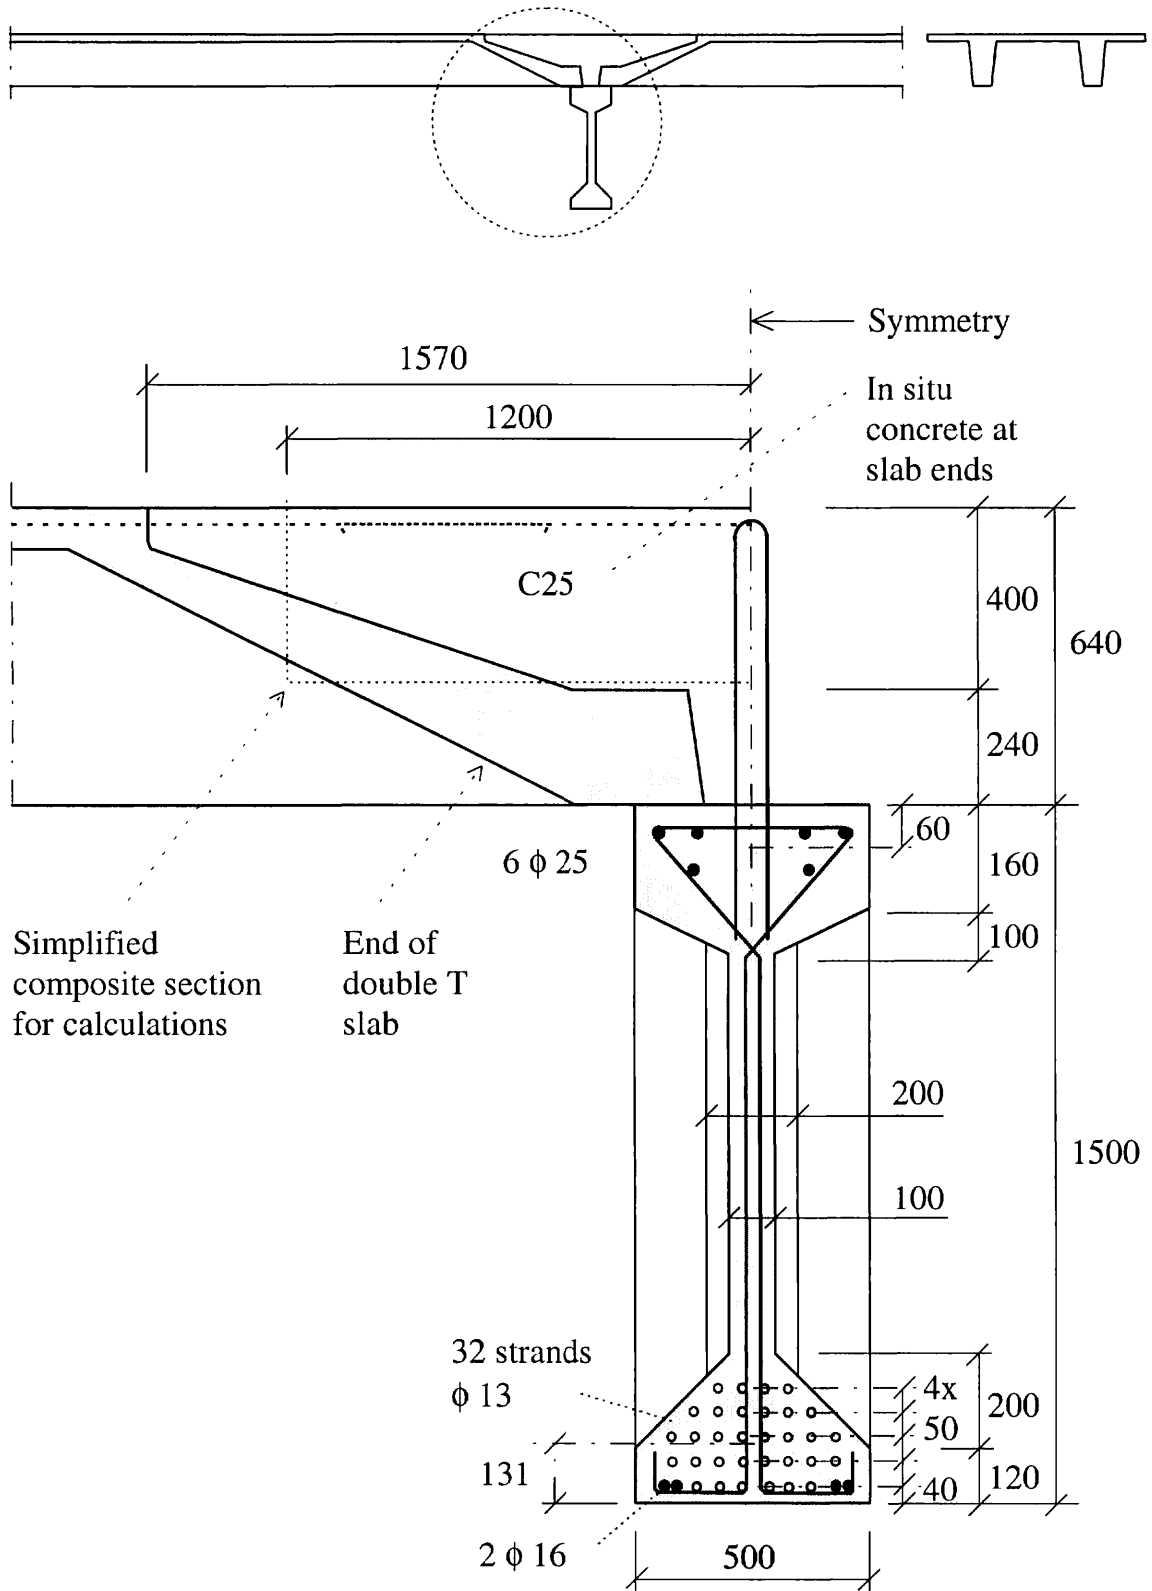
Cross section of beam including adjacent slabs and in situ concrete (shown only on one side).
